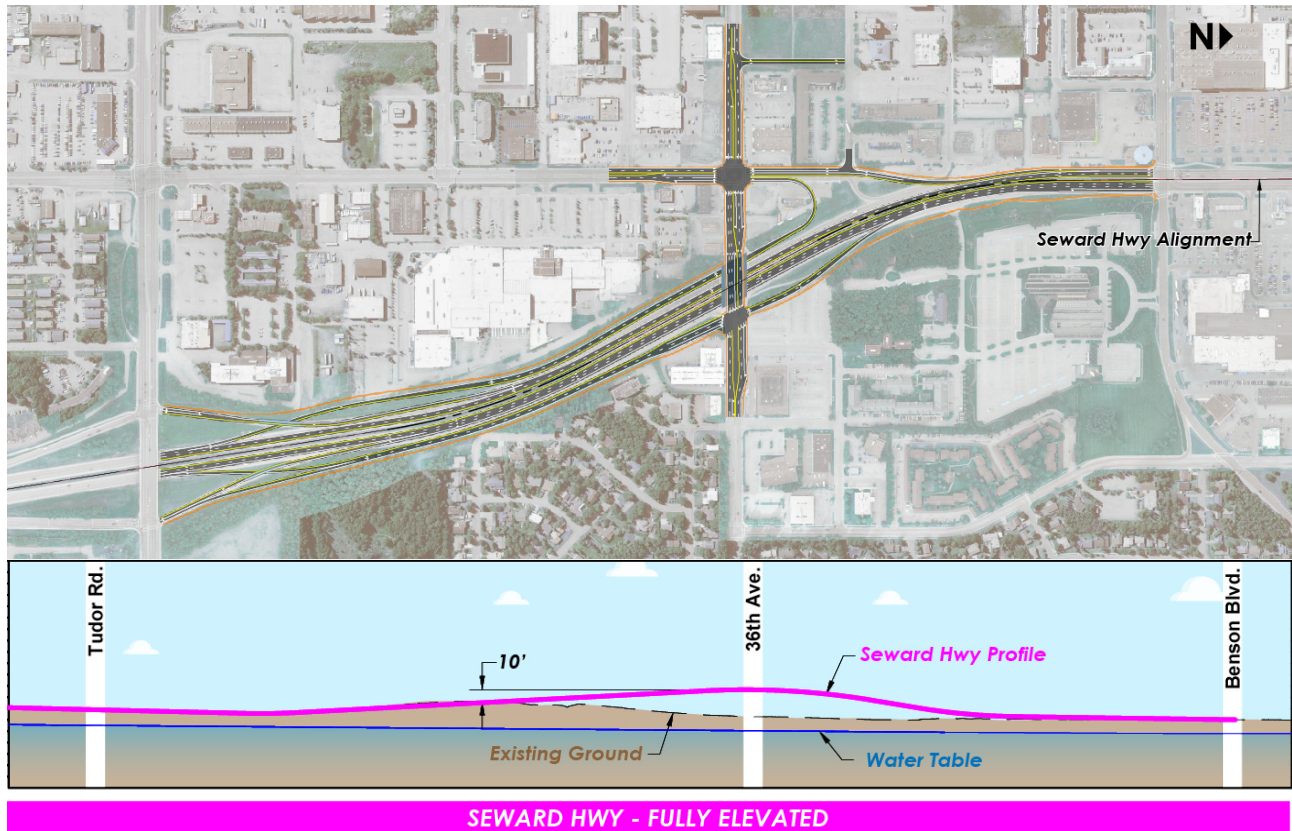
Profile of the Seward Highway elevated over 36th Avenue at grade
